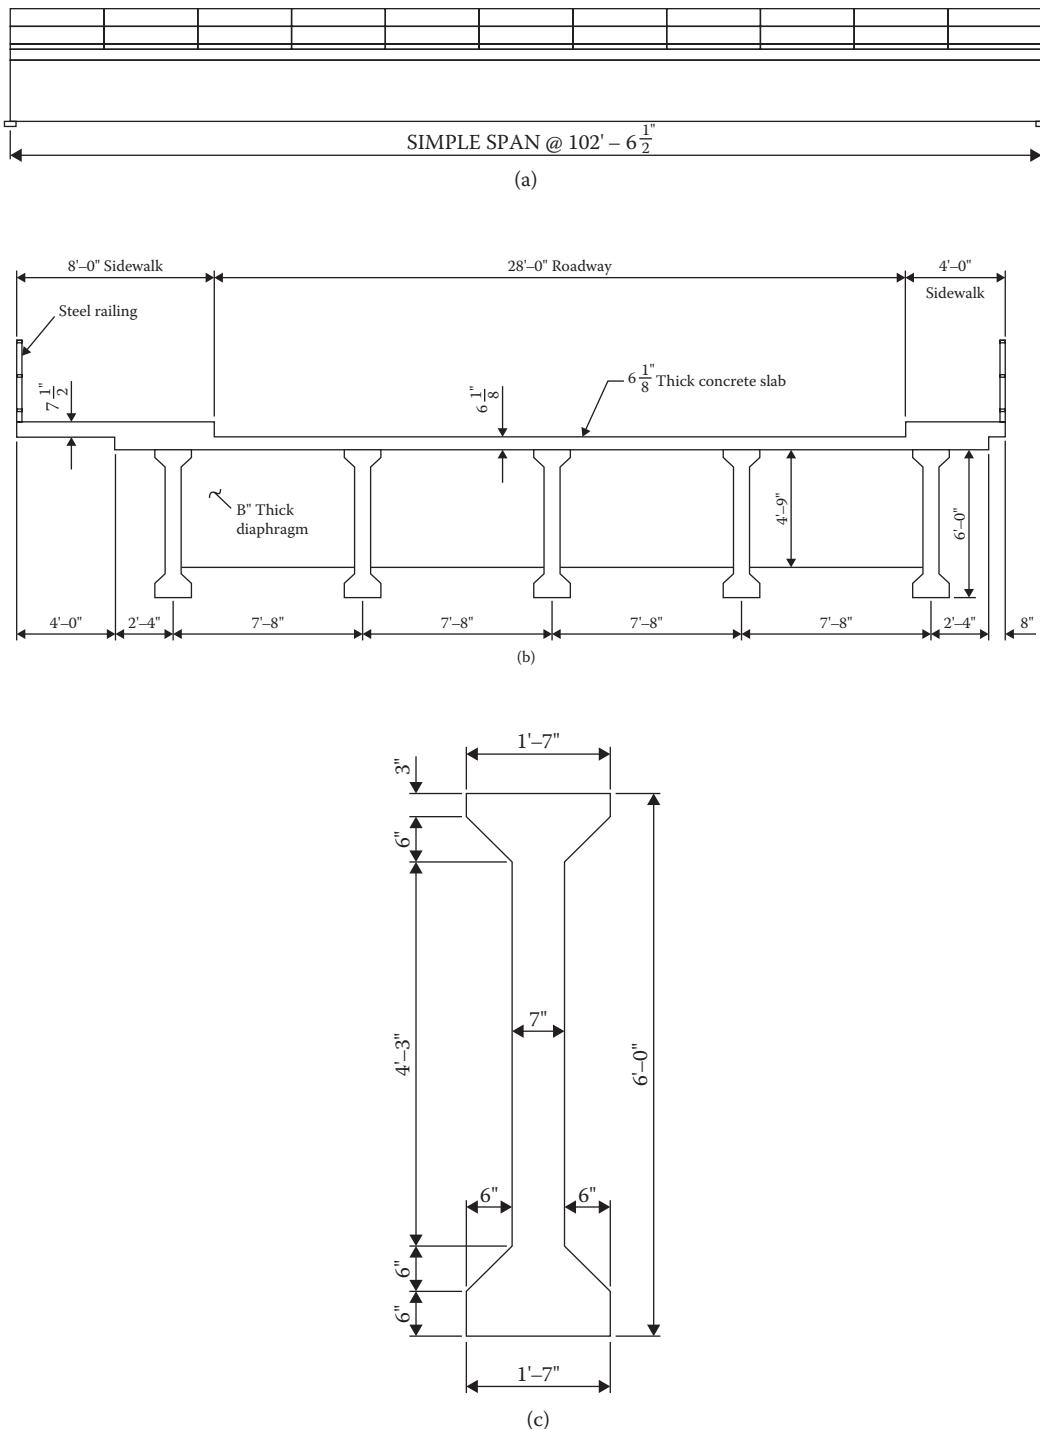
Details of simply-supported precast prestressed concrete I-girder bridge example. (a) Elevation, (b) typical section, (c) precast girder section.
